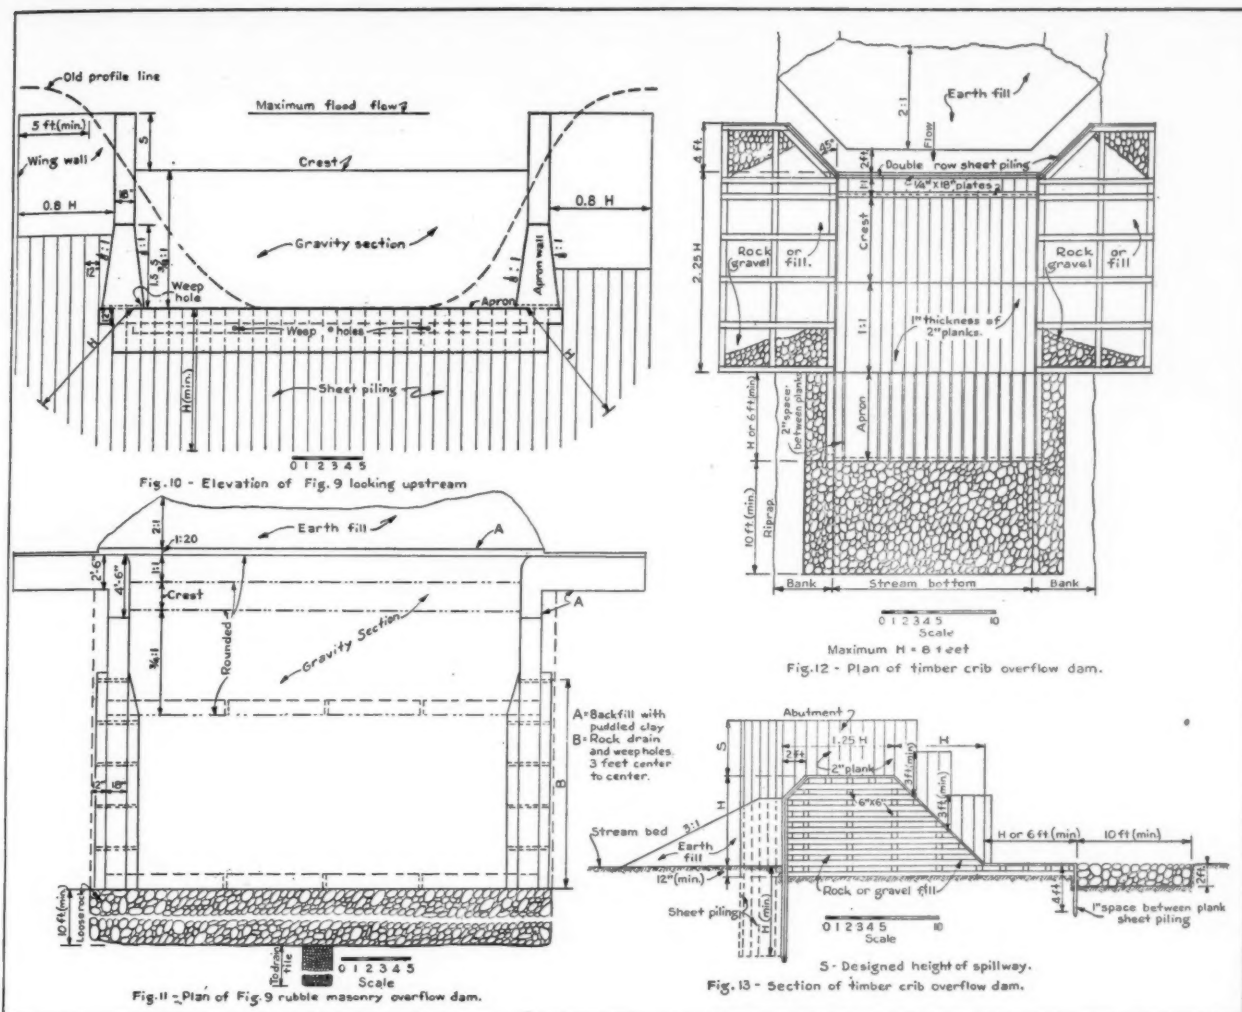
Elevation of Fig. 9 looking upstream. Fig. 11—Plan of Fig. 9 rubble masonry overflow dam. Fig. 12—Plan of timber crib overflow dam. Fig. 13—Section of Fig. 12
